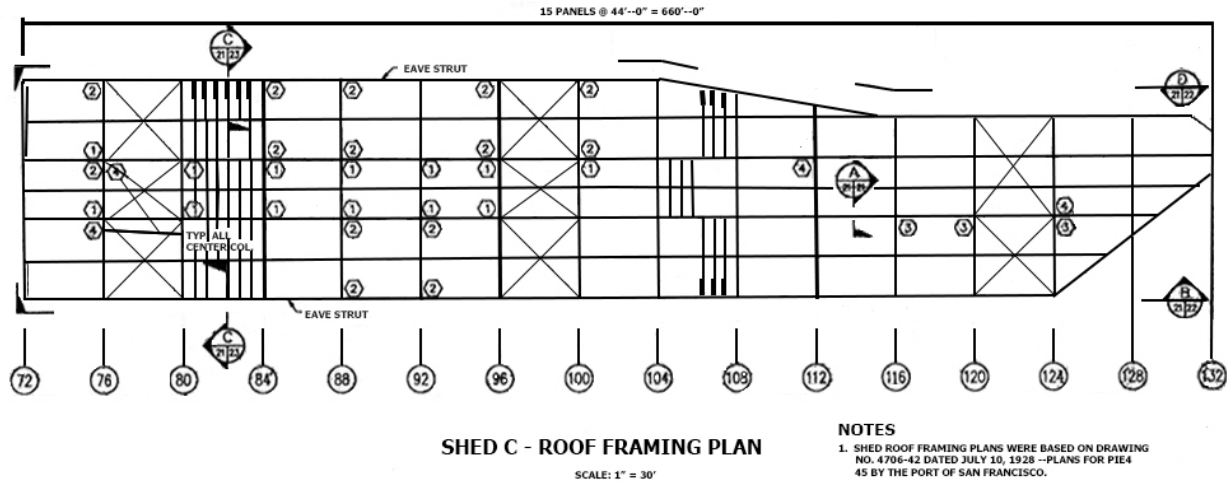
Shed C roof framing plan [sheet 9912-45-1 (21 of 46)].
